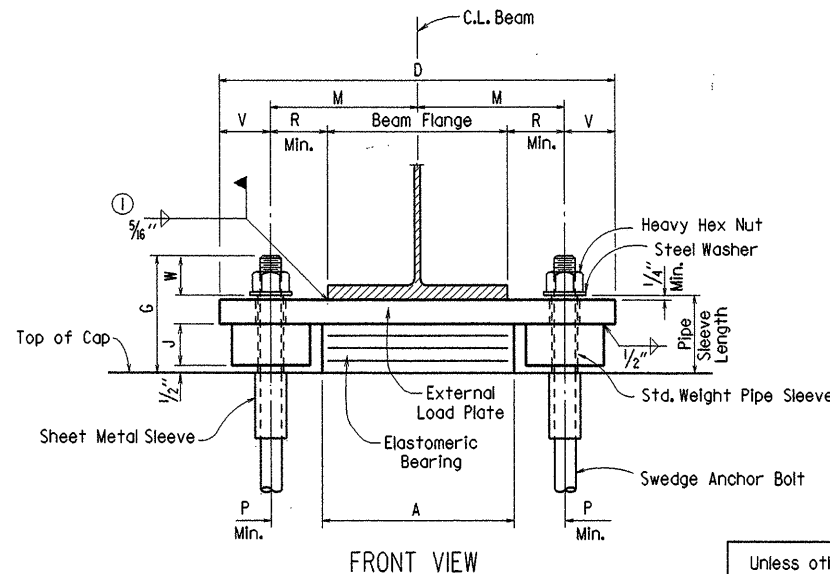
DETAILS OF ELASTOMERIC EXPANSION BEARINGS BRIDGE OVER I-30
